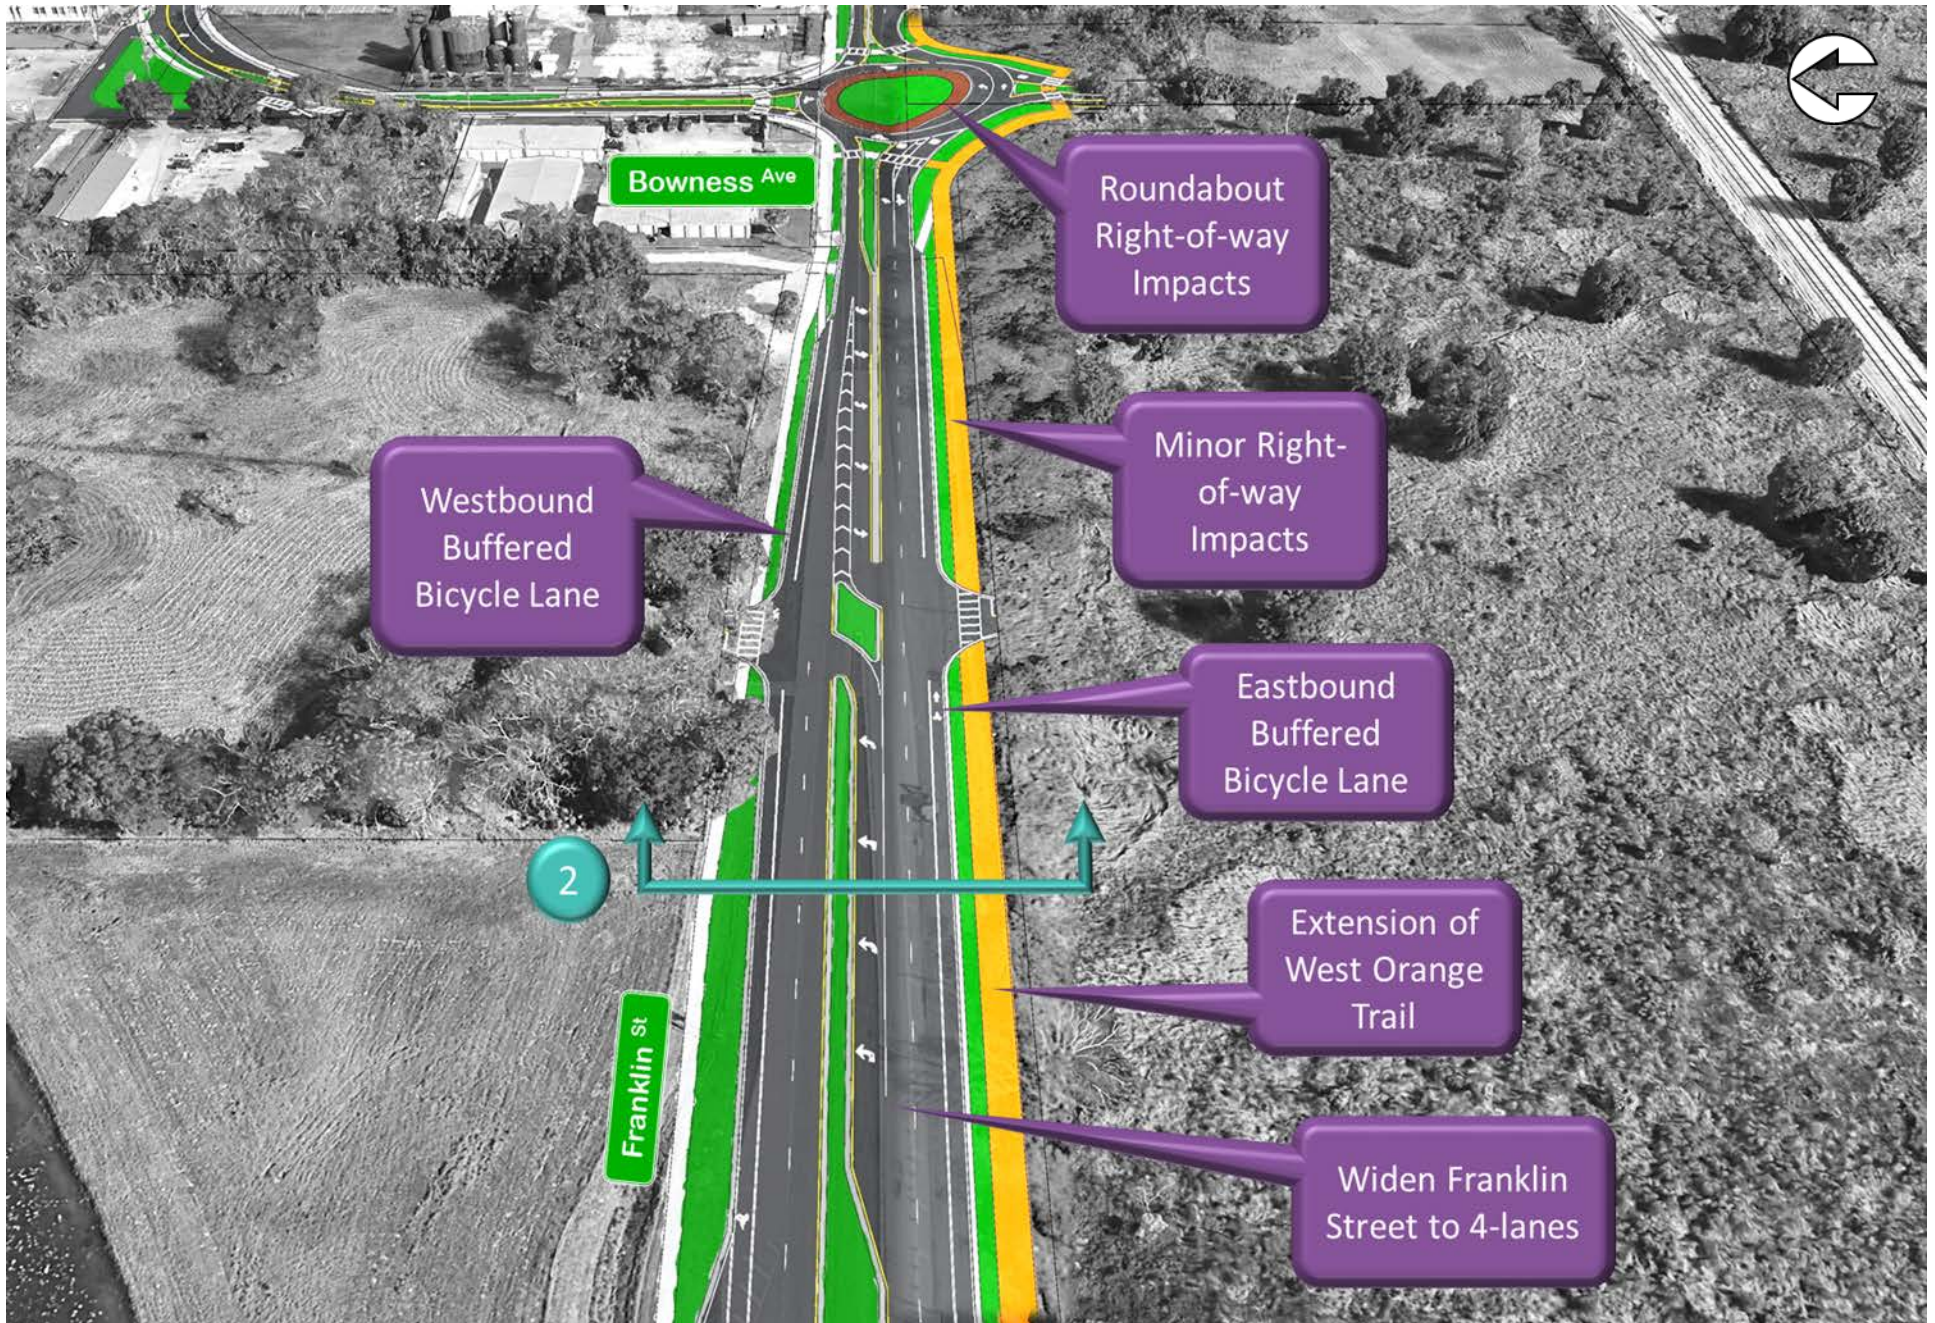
| Concept Plan – Franklin Street west of Bowness Avenue
